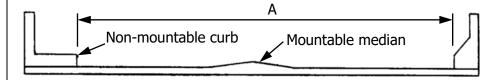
Cross-section view of a highway feature carried on the bridge with a mountable median.
